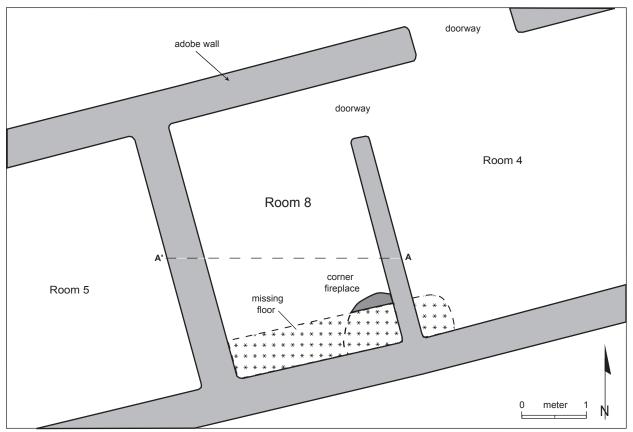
Plan of Room 8, Structure 1 at the Trujillo House.
